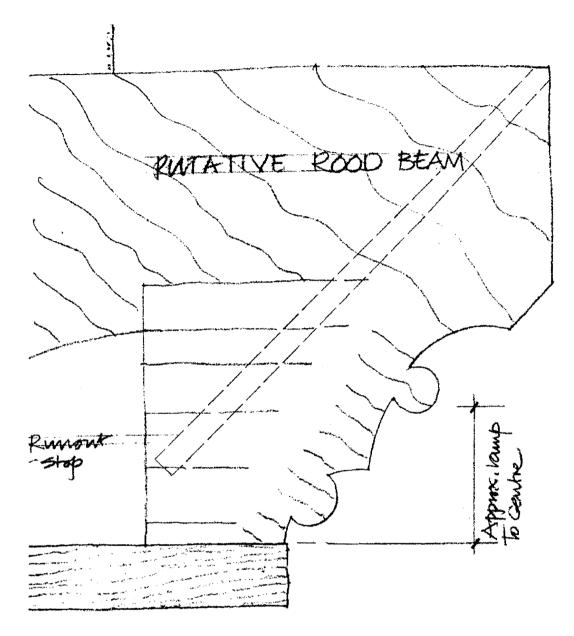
Drawing of the chancel arch beam showing the approximate position of the core extracted for dendrochronology, adapted from an original drawing by John Winstone
